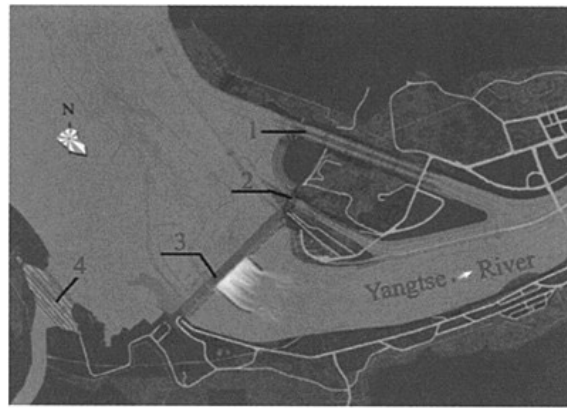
The Three Gorges Project layout: (1) navigation lock; (2) ship elevator; (3) concrete gravity dam; (4) Maopingxi rockfill dam.
